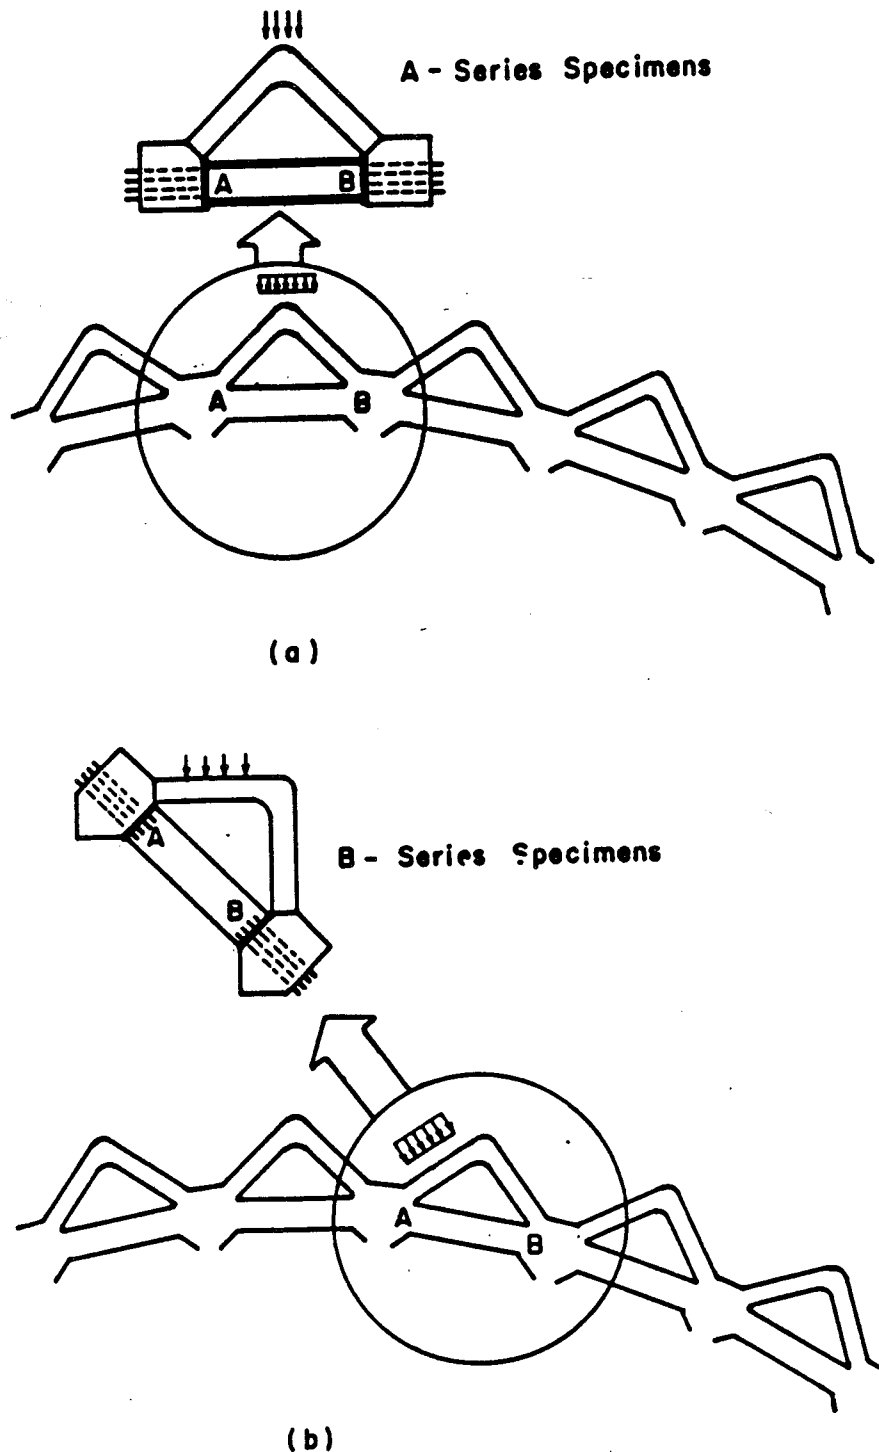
V-Shaped Arch Test Specimen from R/C
